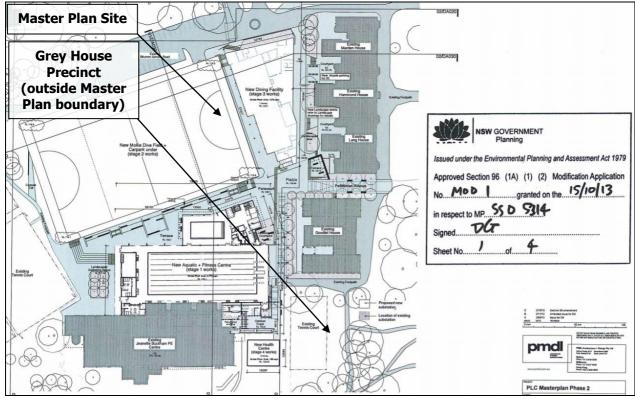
SSD 5314 MOD 1 Stamped Site Plan (PMDL 2012)
